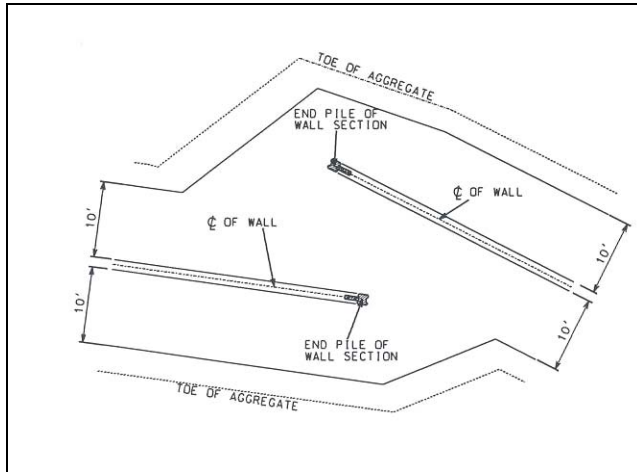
Detail of concrete panel wall with gaps (NRCS 2004a).
